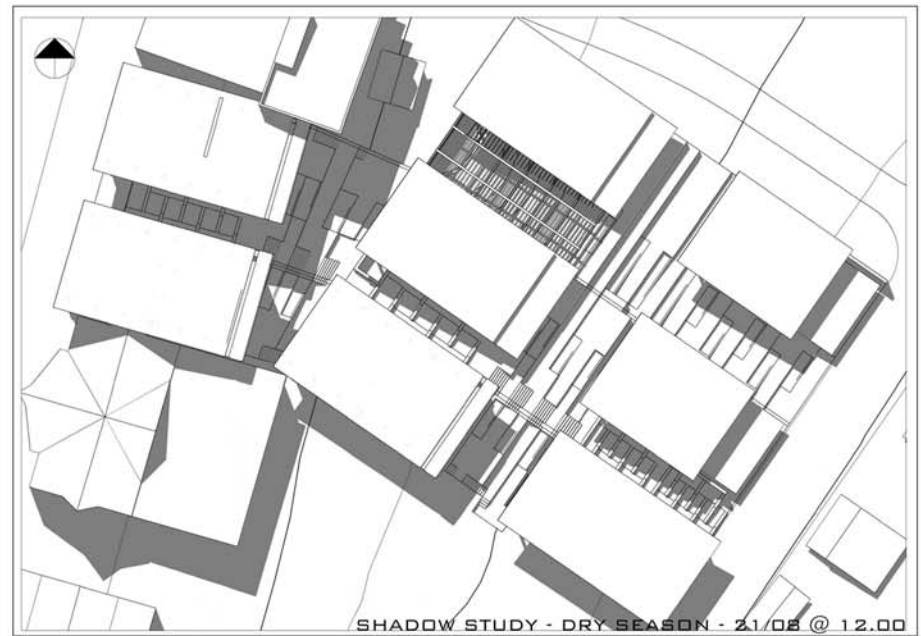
SHADOW STUDY ON 21 AUGUST AT 12.00 - SITE PLAN (AUTHOR, 2006).
